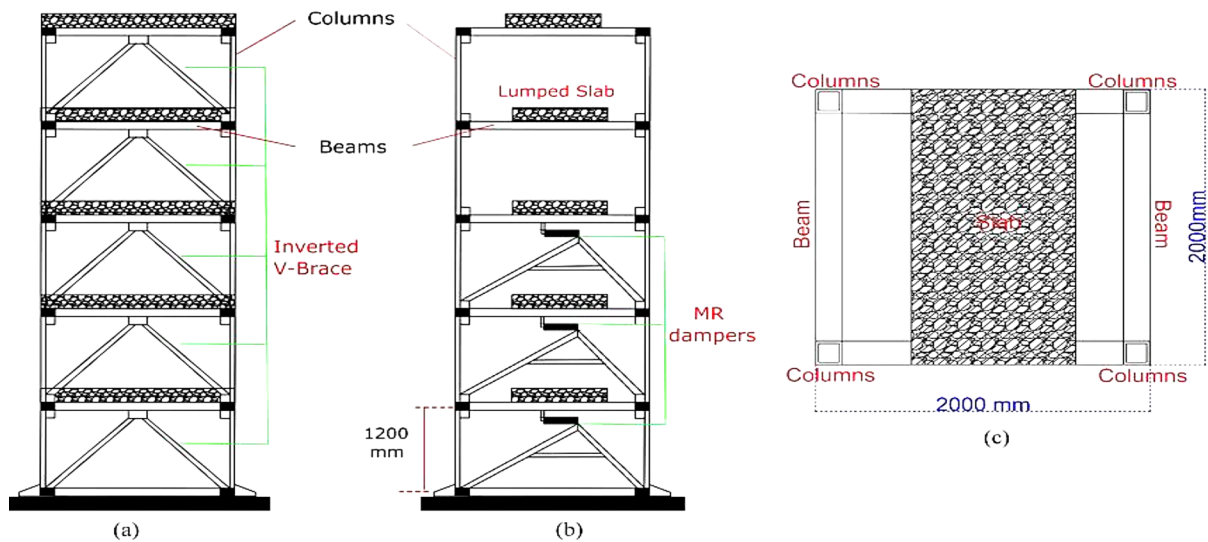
(a) XY elevation; (b) XZ elevation and (c) plan [36].
